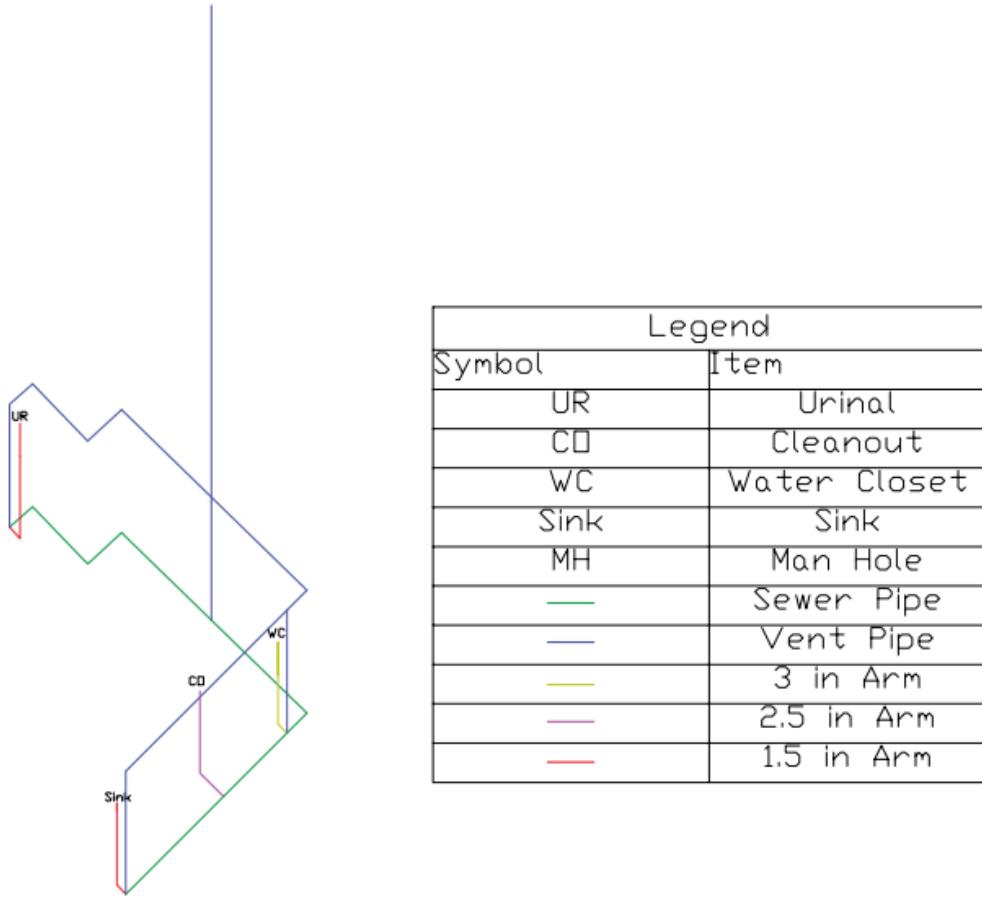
Isometric View of Sewer and Vent Pipes Floor 2
